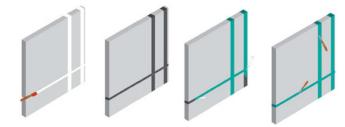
Typical installation in a wall of a linear joint using a gun grade sealant, from left to right: clean the supporting construction, install the backing element, dispense the sealant and tool it.
